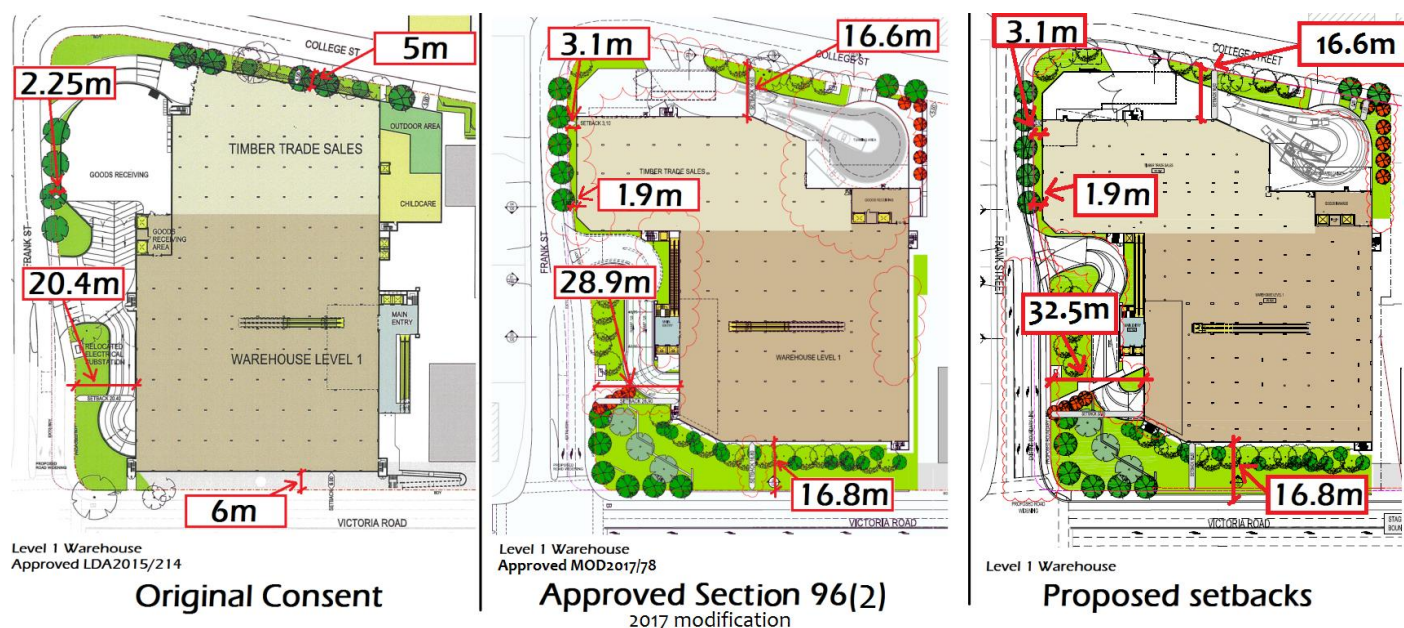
Building setbacks of the Stage 1 development as approved (LDA2015/215 & 2017 modification) and proposed modification.
